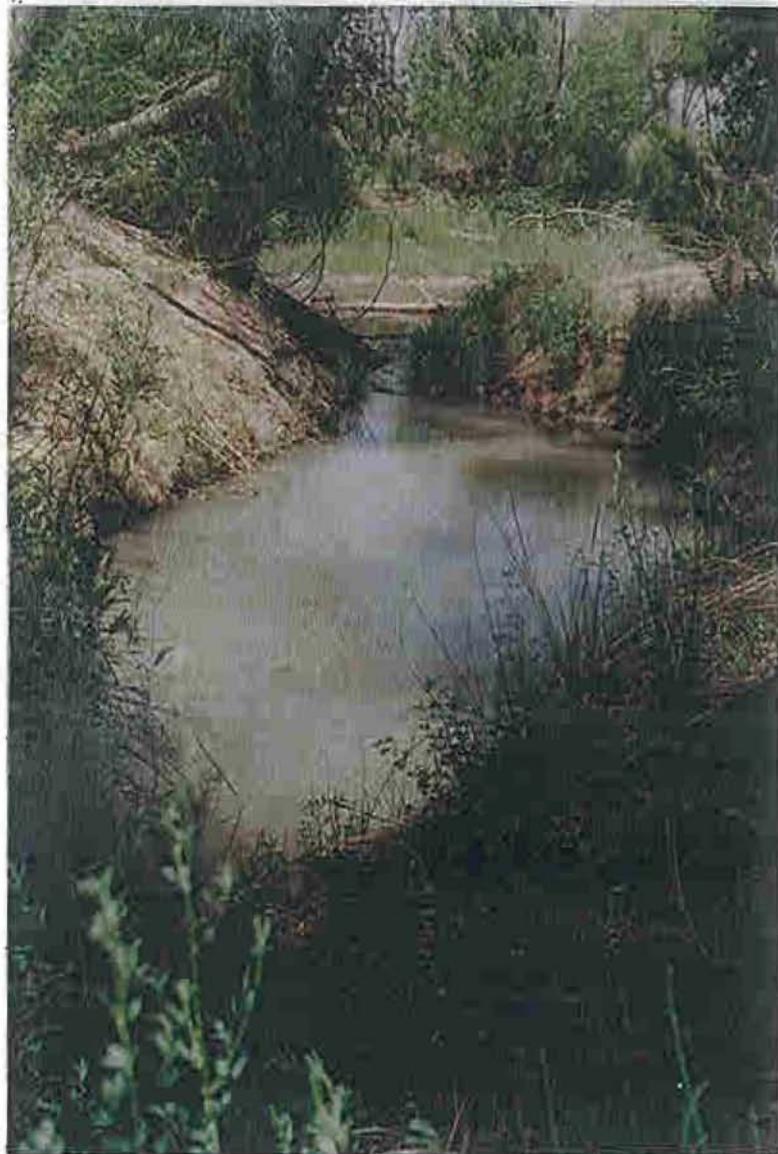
Site 300 feet downstream of railroad crossing. Looking north along alignment at right abutment.
